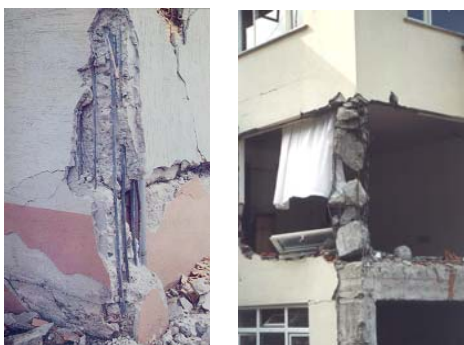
Damaged RC columns without transverse reinforcement (Saatcioglu *et al.*, 1999)
